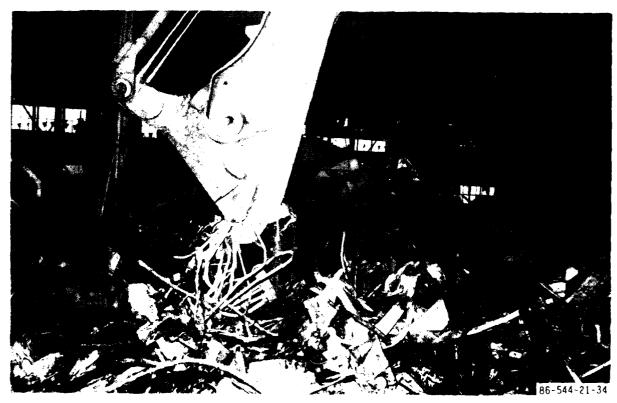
Caterpillar 235 shear shearing material inside Building 666.
